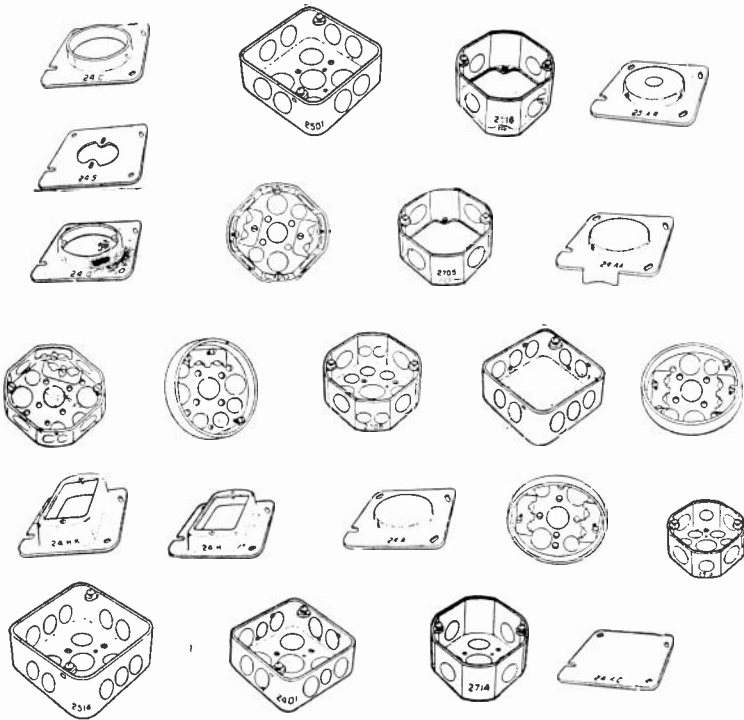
Several types of outlet boxes and covers. Note the arrangement and size of the "knock-out" openings.
